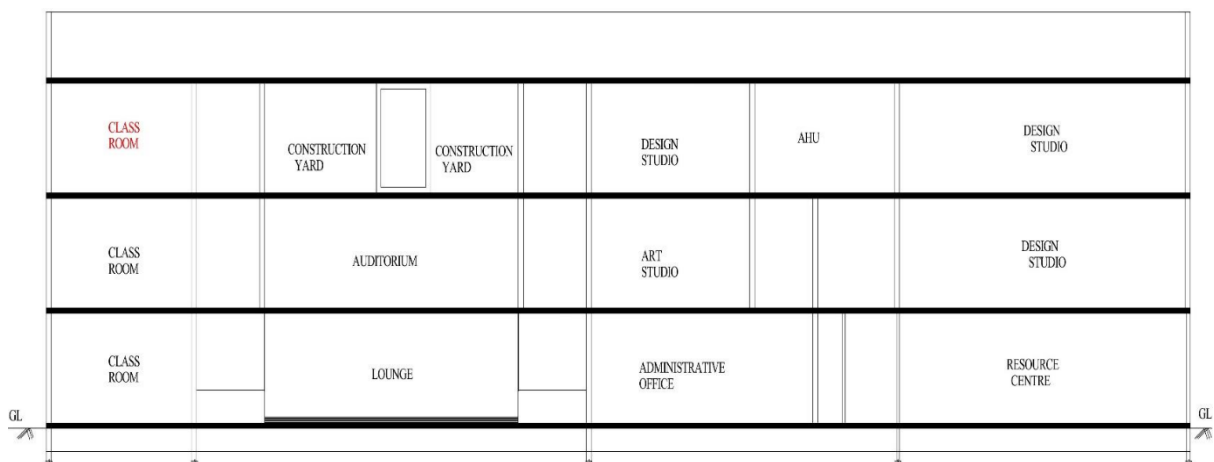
ElevationFig. 13.4 Section
